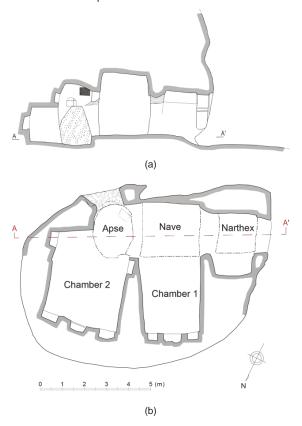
The drawings of the Üzümlü Church: a) East-west (AA') section; b) Ground floor plan.
